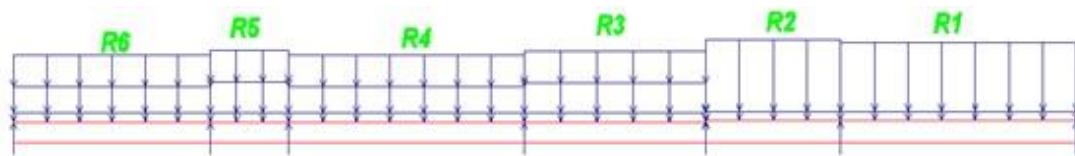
8) beam loads from ribs and (dead +live) + wall load .
